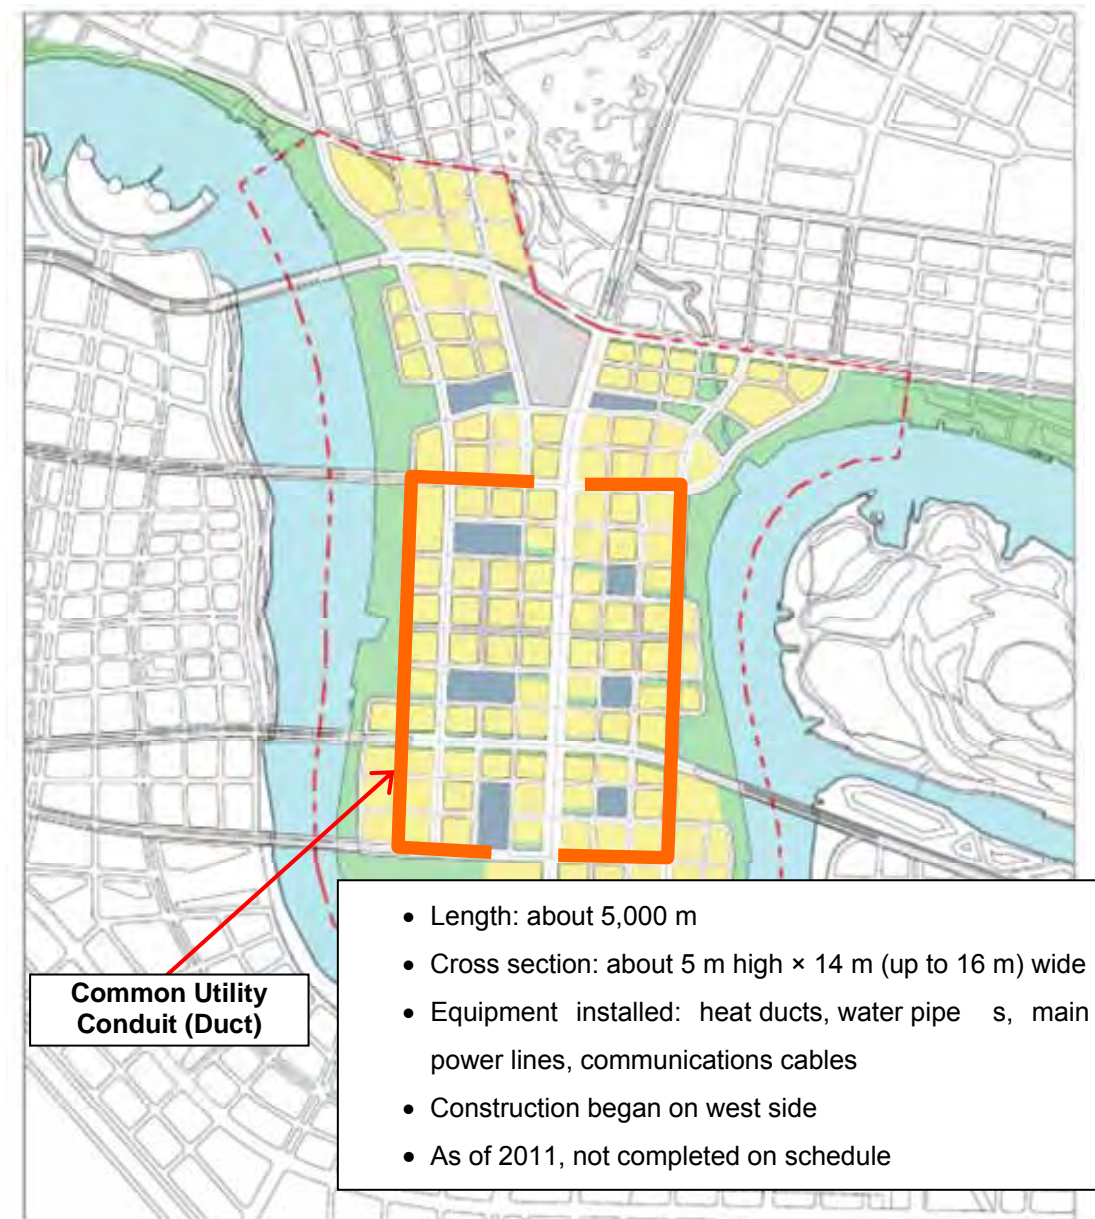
Common Utility Conduit (Duct) Plan
